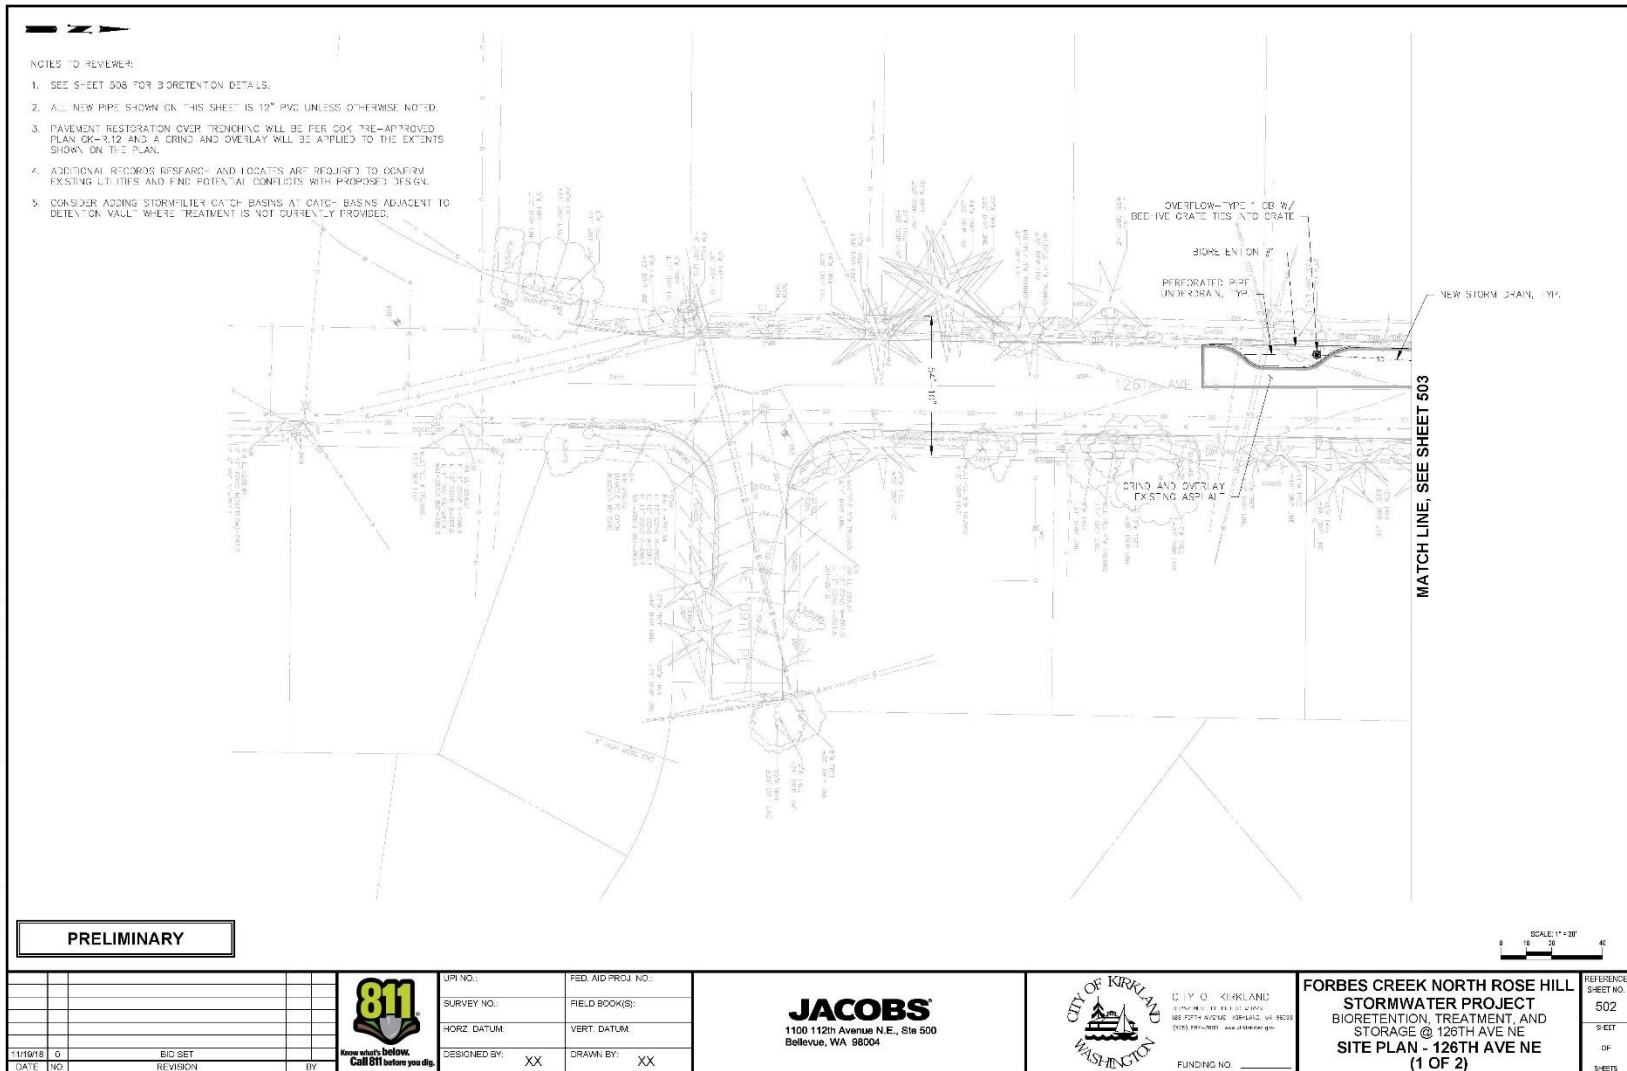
Preliminary Site Plan for Site 5 - Forbes/North Rose Hill Stormwater Retrofit
